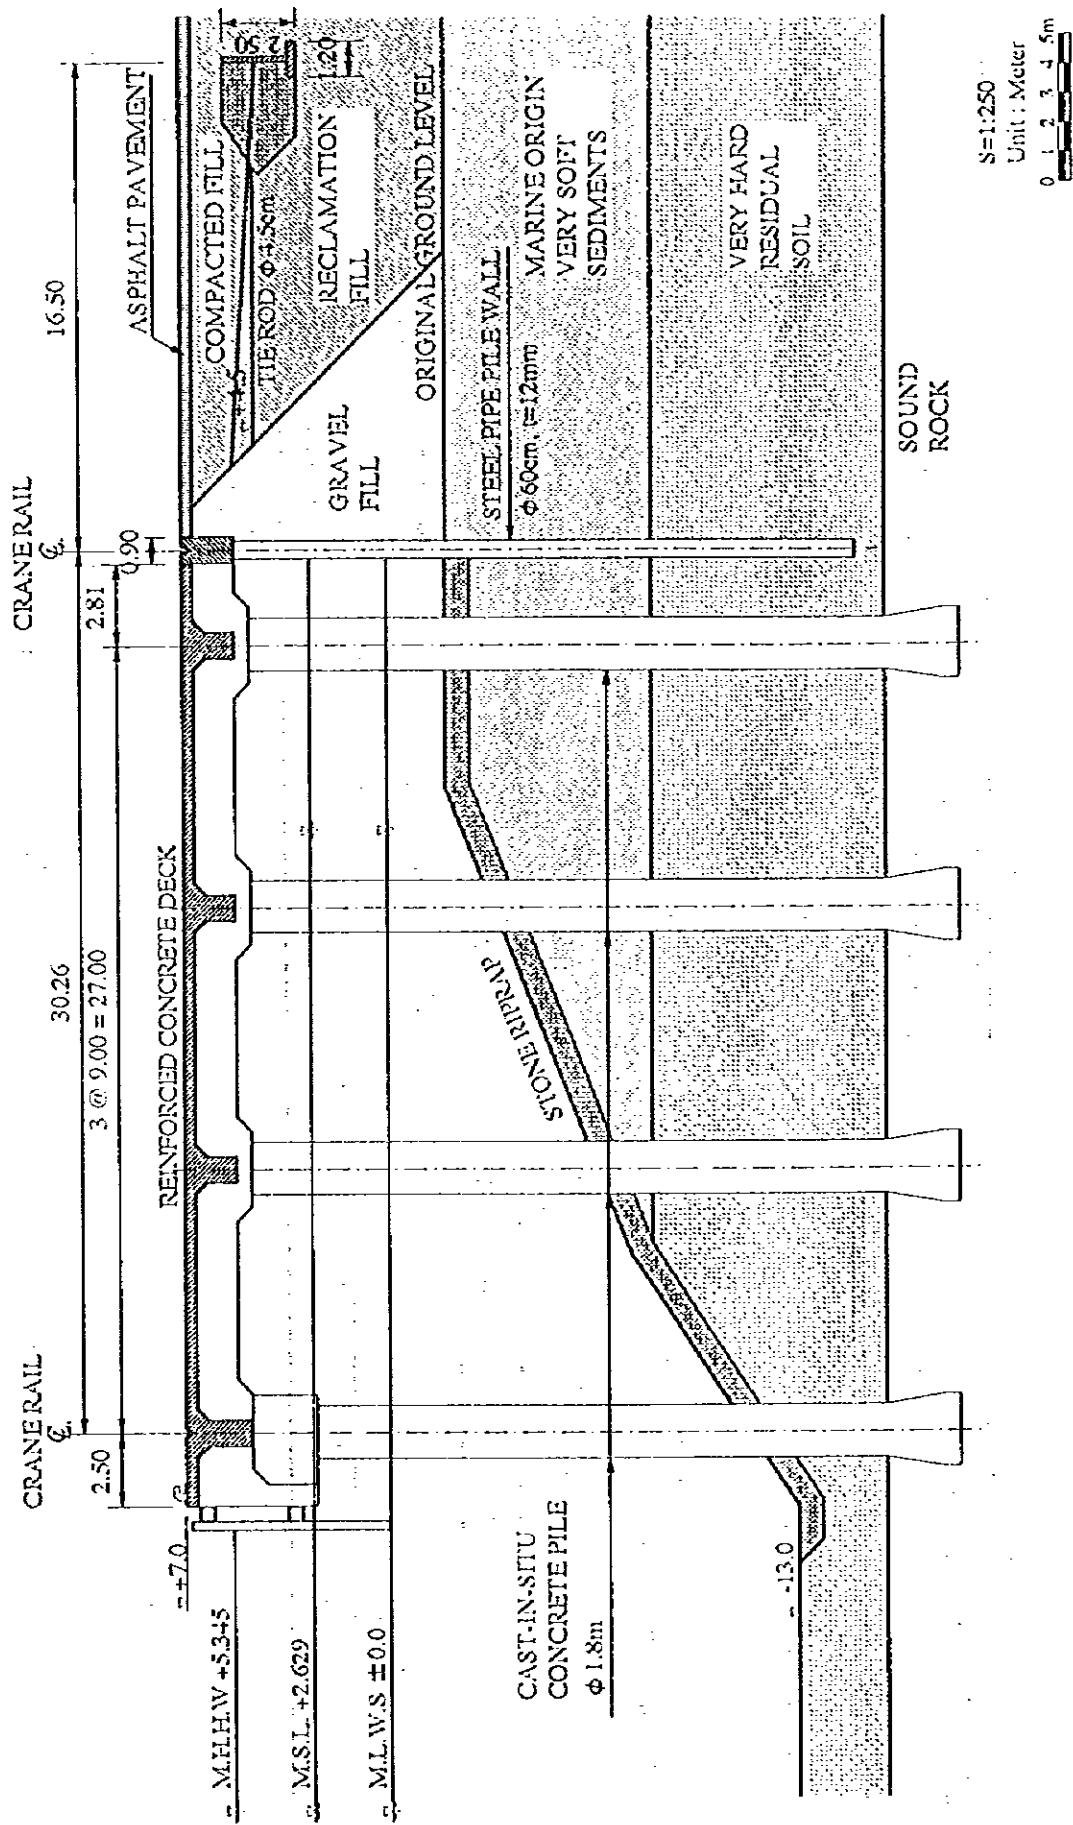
Conceptual Cross Section of Container Terminal Berth Alt.-2
